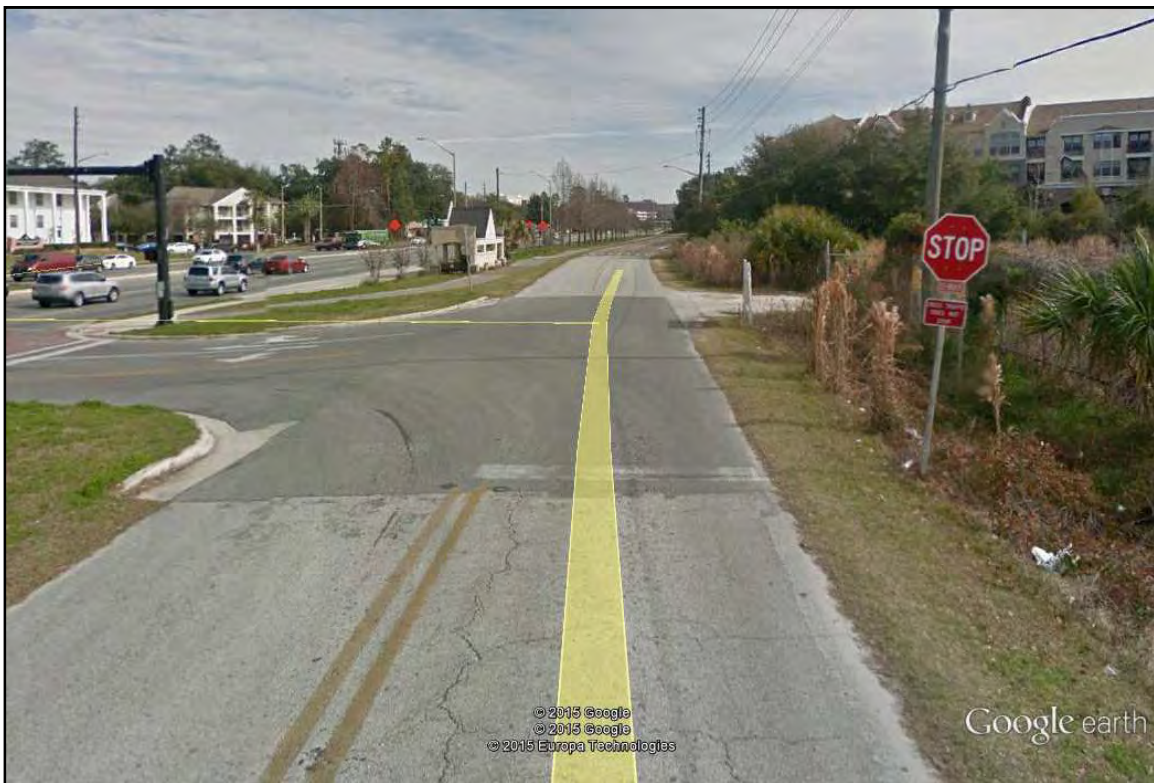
Old Archer Road & SW 23rd Drive Intersection (East Bound)
